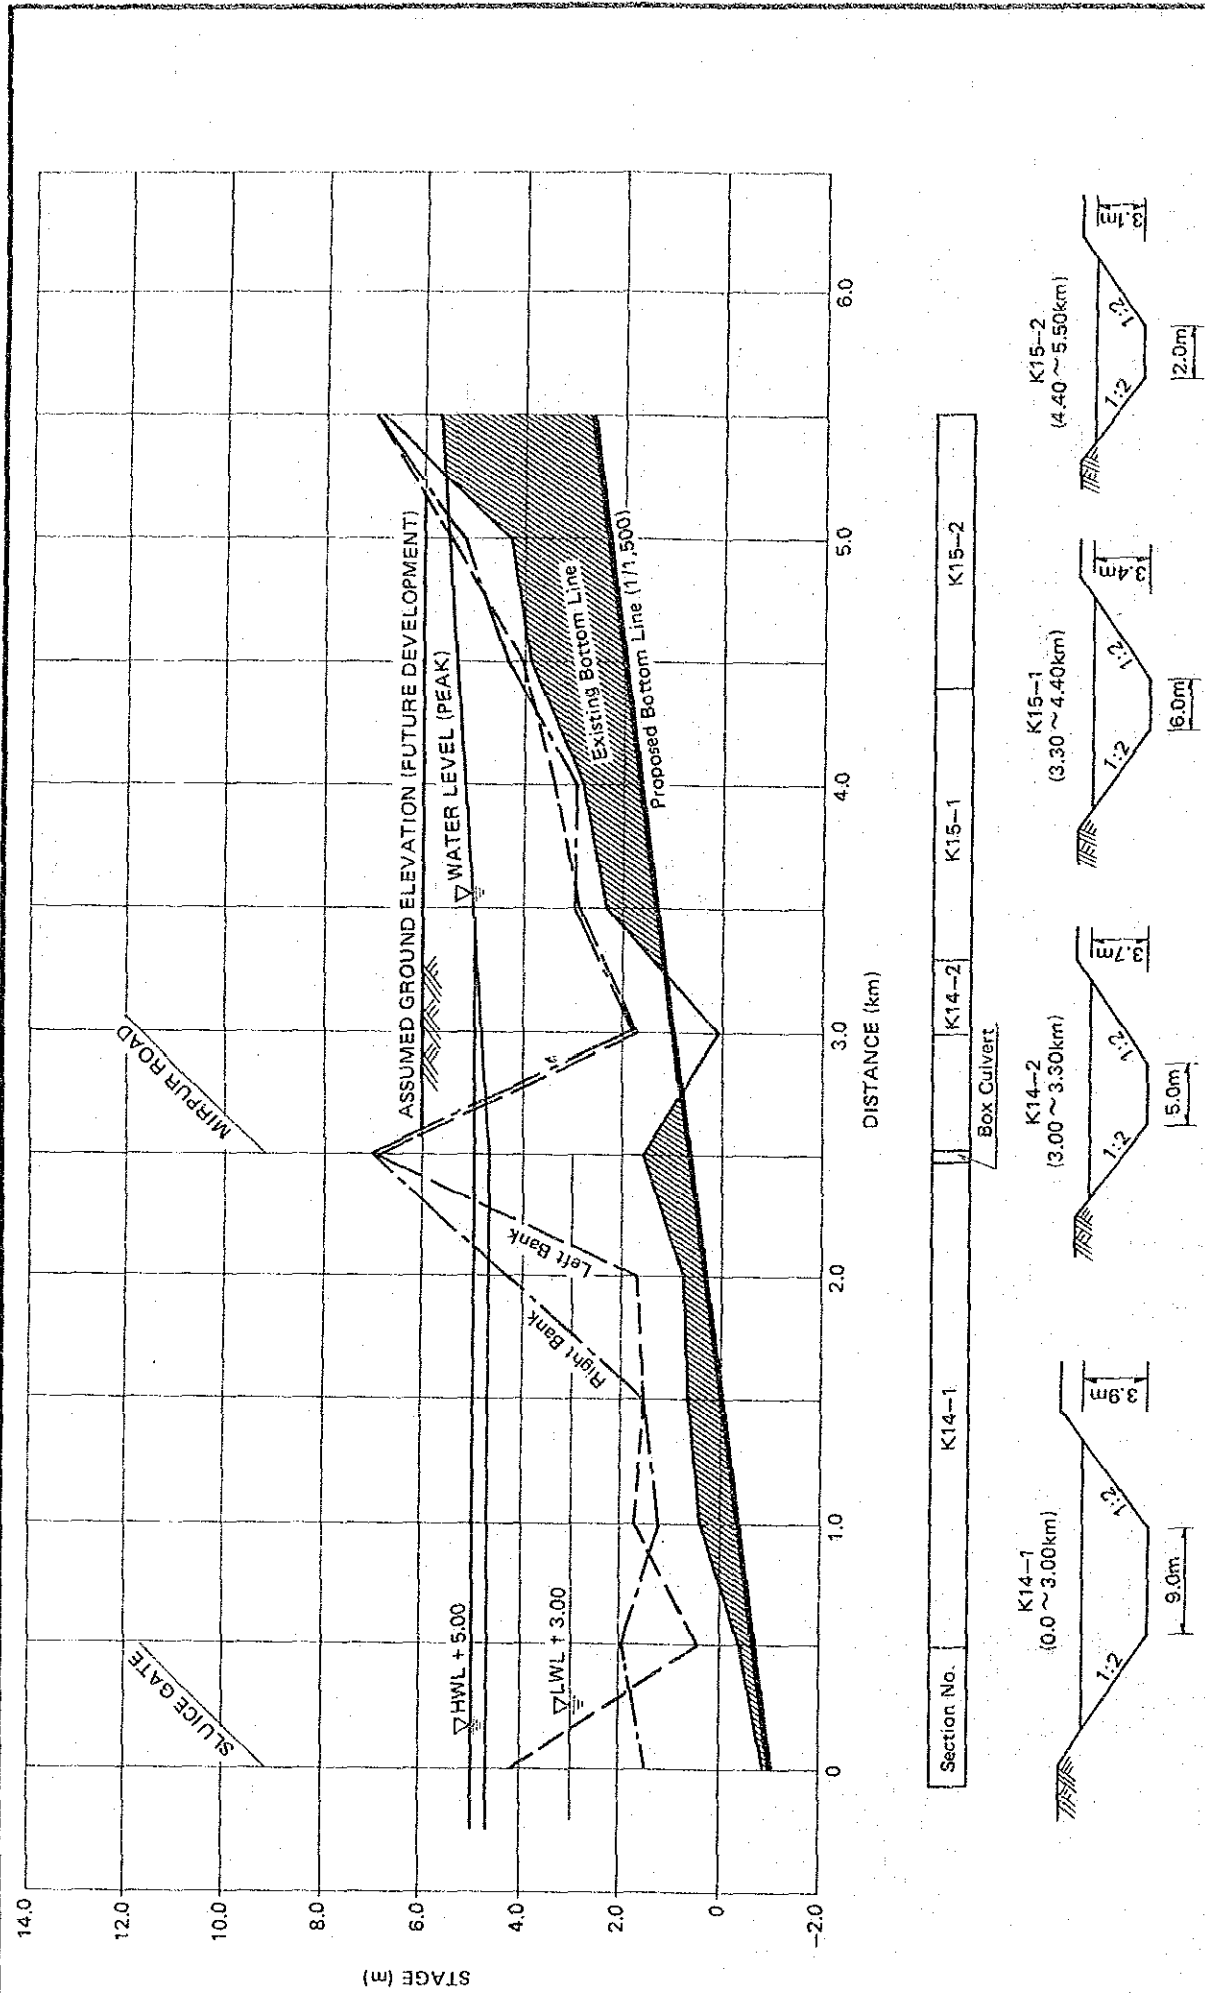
PROPOSED LONGITUDINAL AND CROSS SECTIONS OF KALLYANPUR
